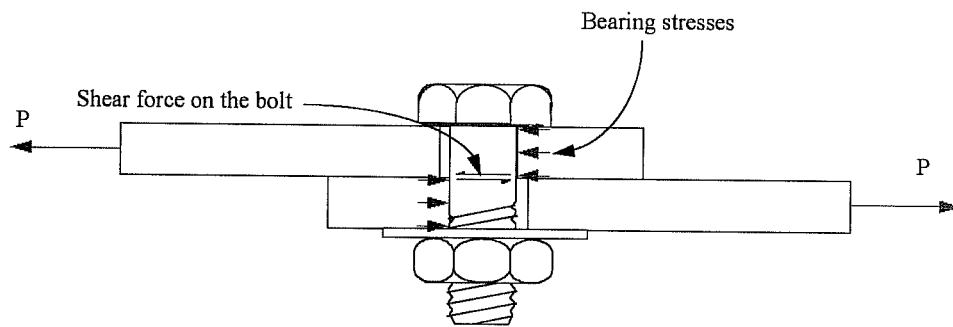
The transfer of shearing load through bearing and shearing stresses in a bearing-type connection
